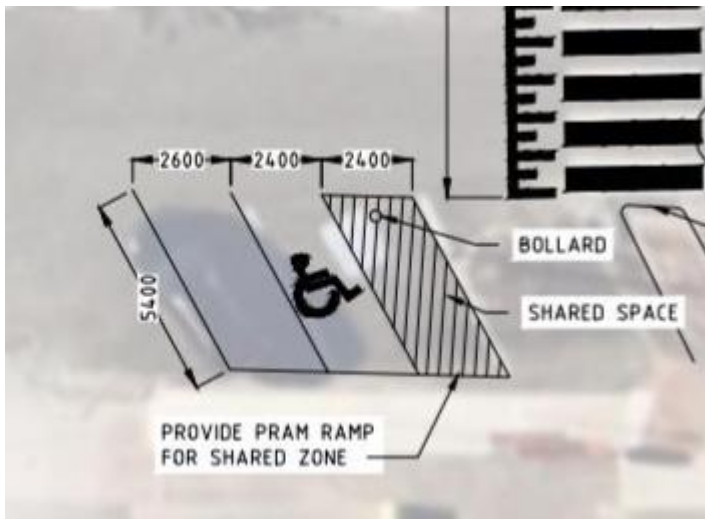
Disabled parking spaces previously approved on Gate Street, Kootingal.
